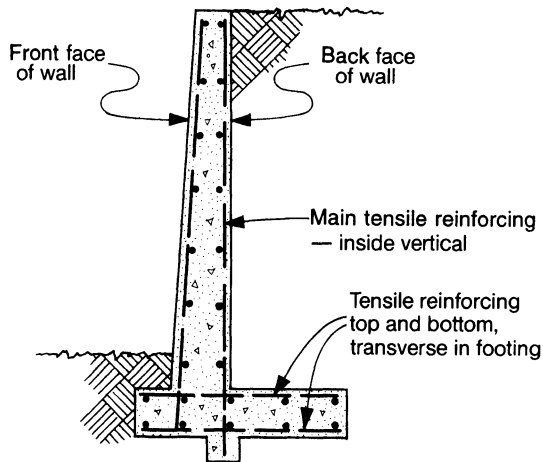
Typical reinforcing for a cantilever retaining wall. Shear key omitted for clarity.
